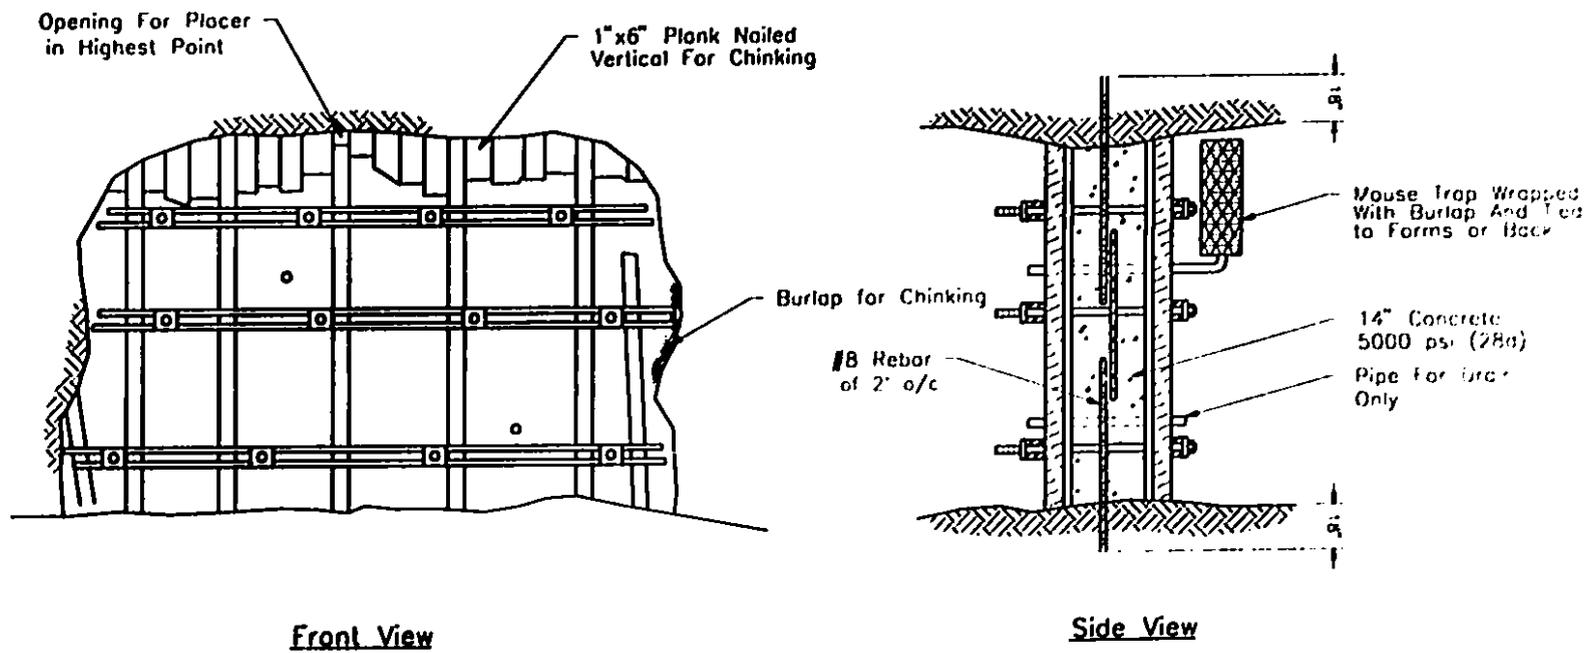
Kidd Creek Mines Standard Concrete Bulkhead
